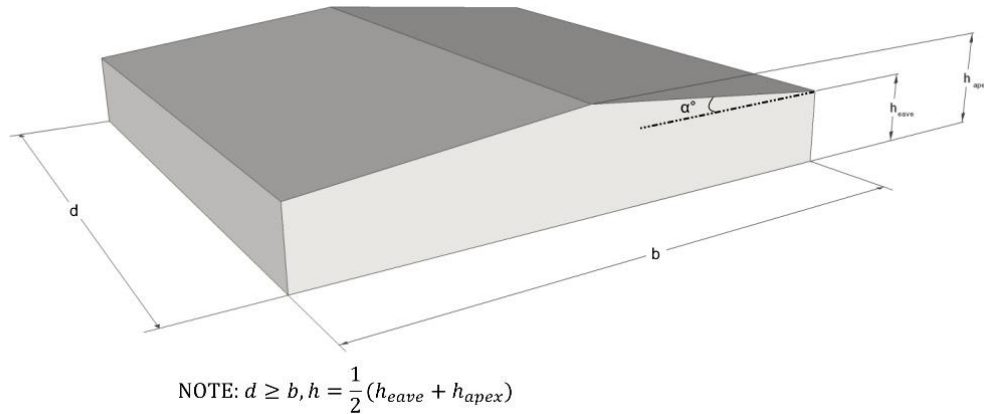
Building Design Parameters (Adapted from Figure 1a of MEL Wind Tunnel Test)
